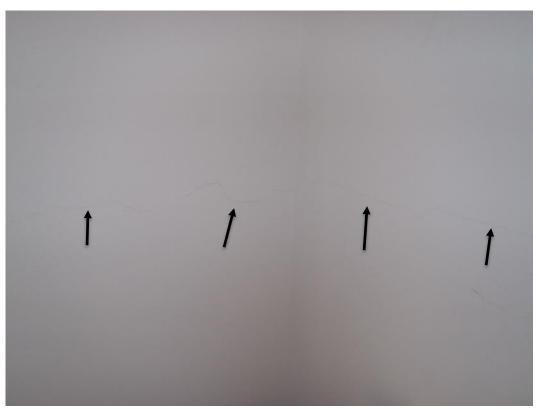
shows evidence of horizontal previous repairs to the south-eastern external corner.
